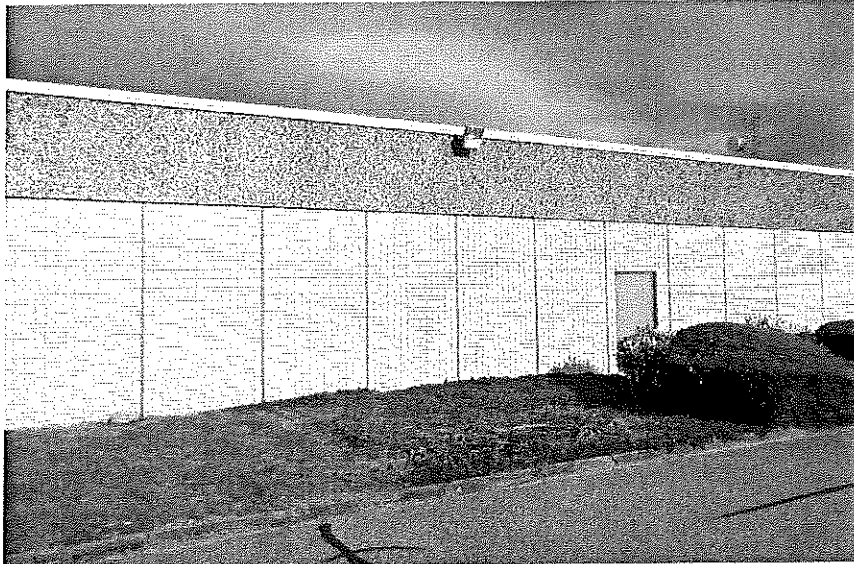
Brick masonry building façade at bank entrance (west wall)
